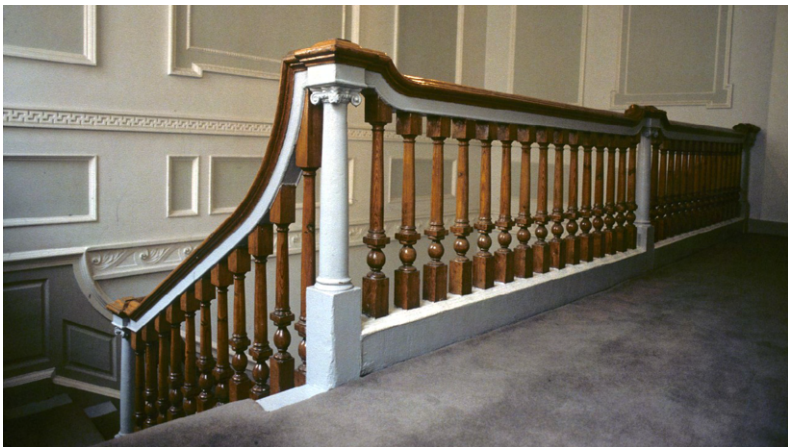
Staircase, Doneraile House, Kildare Street, Dublin.
